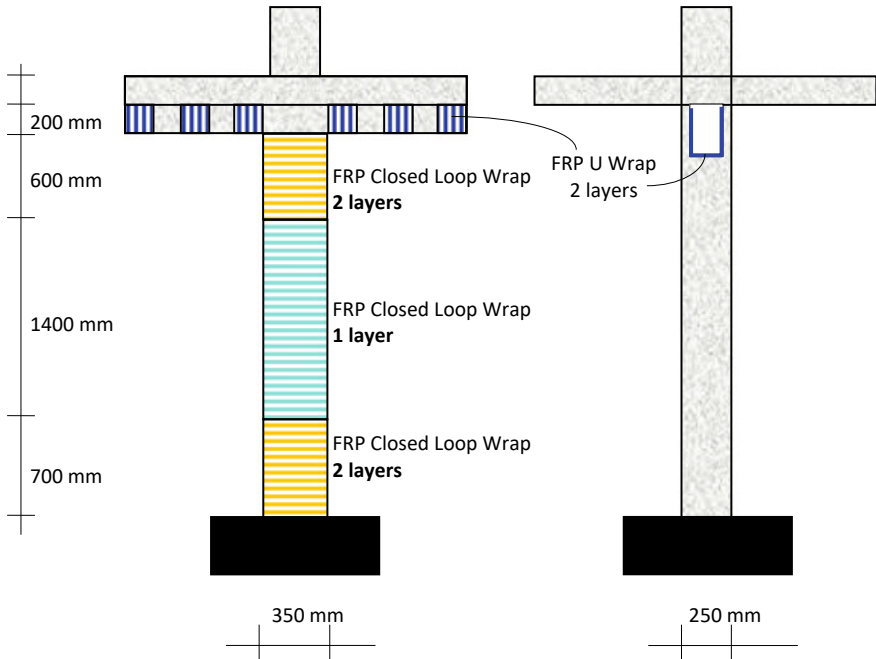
Details of FRP Jacketing in ground floor columns and beam
